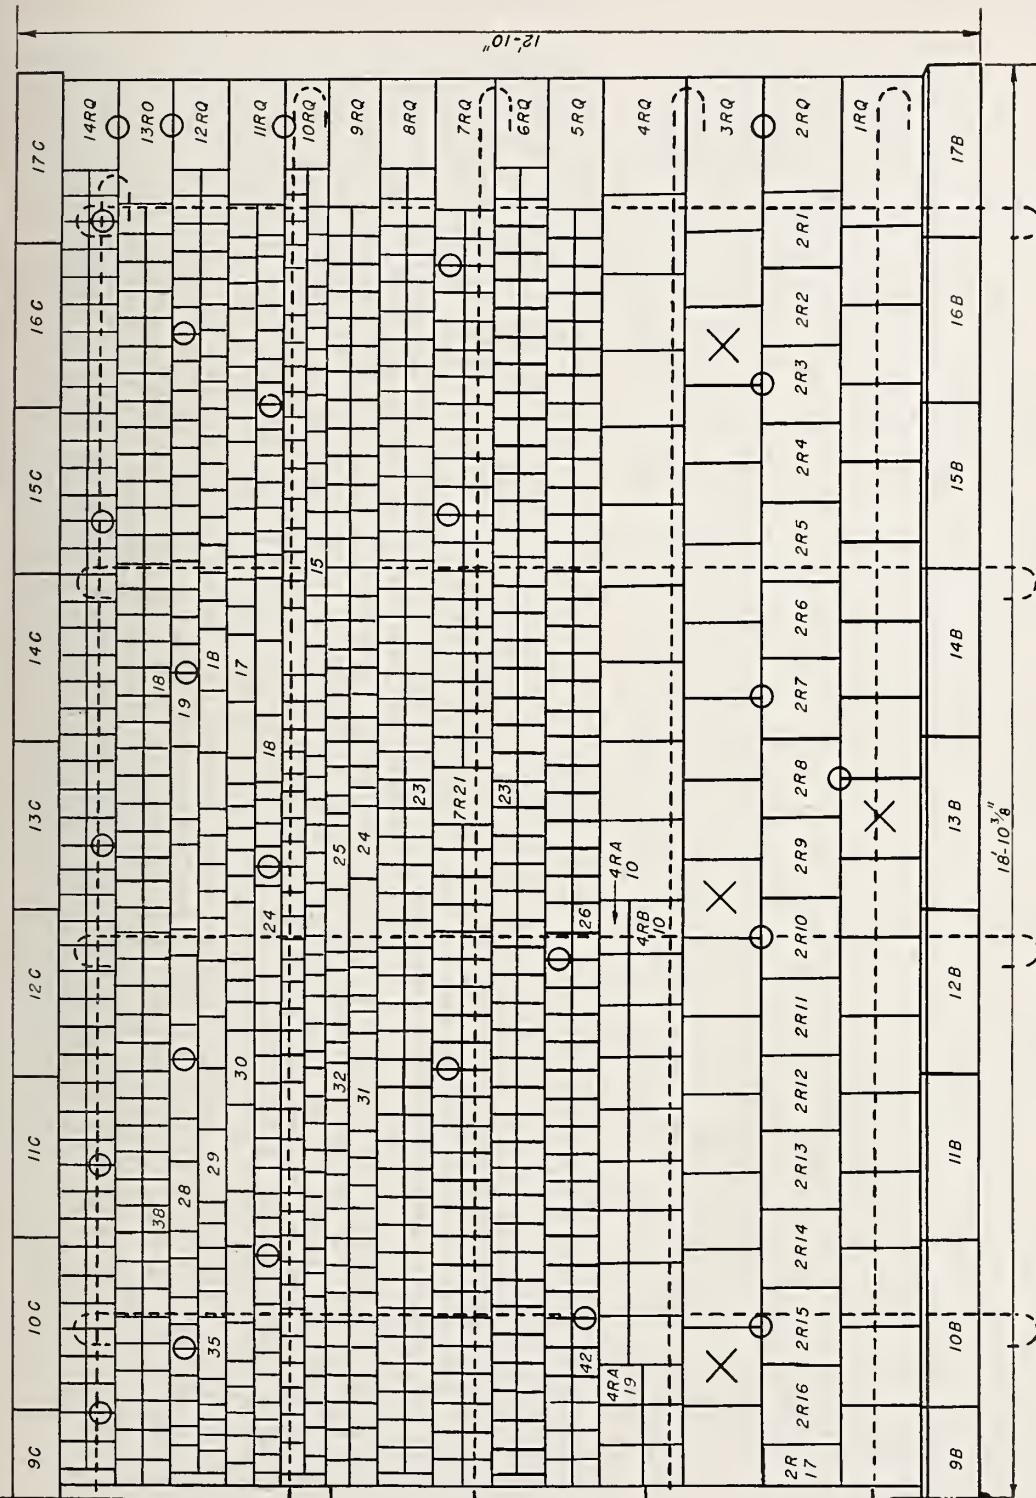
Continued. Structural details of stone exposure test wall.
